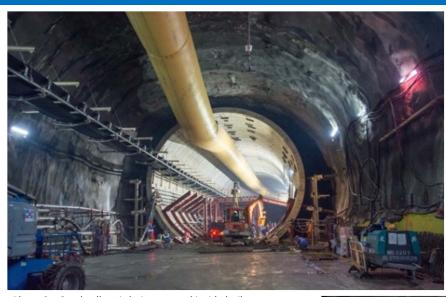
Steel gallery is being erected inside built segmental lined tunnel
